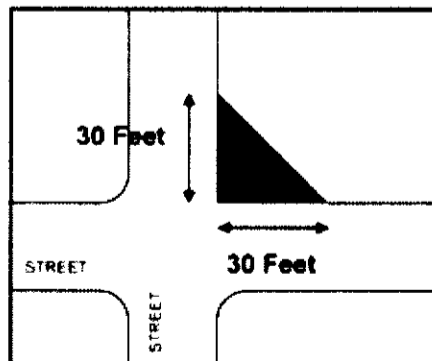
(e)(2)A.1. Traffic safety vision clearance for intersecting streets.
